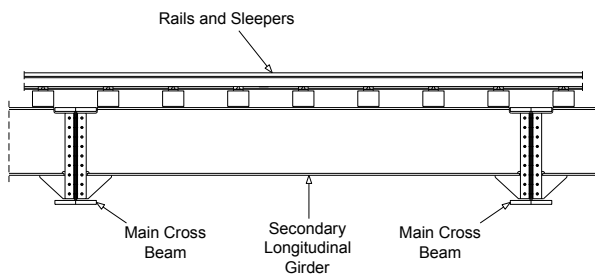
Side view of secondary longitudinal girders with variable end cross sections
